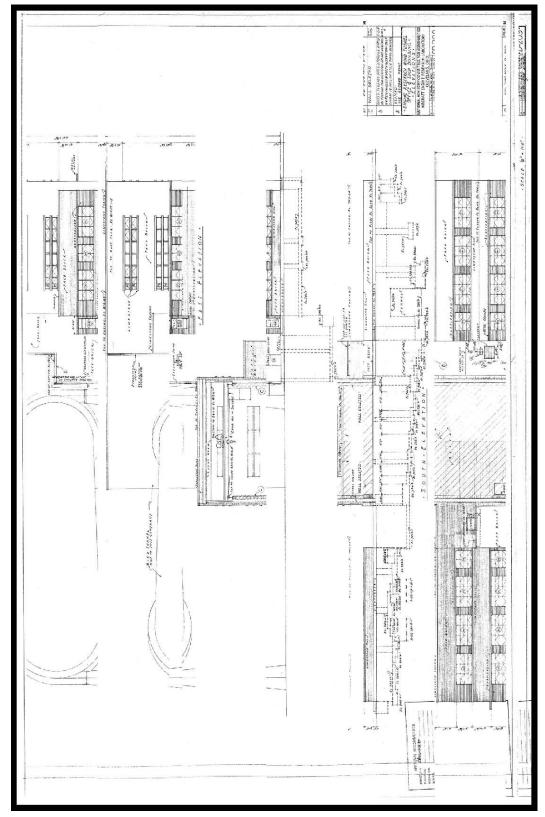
Elevation drawing of Shop and Office Building, 1942 (OH_Cuyahoga_AWT-Support_013).
